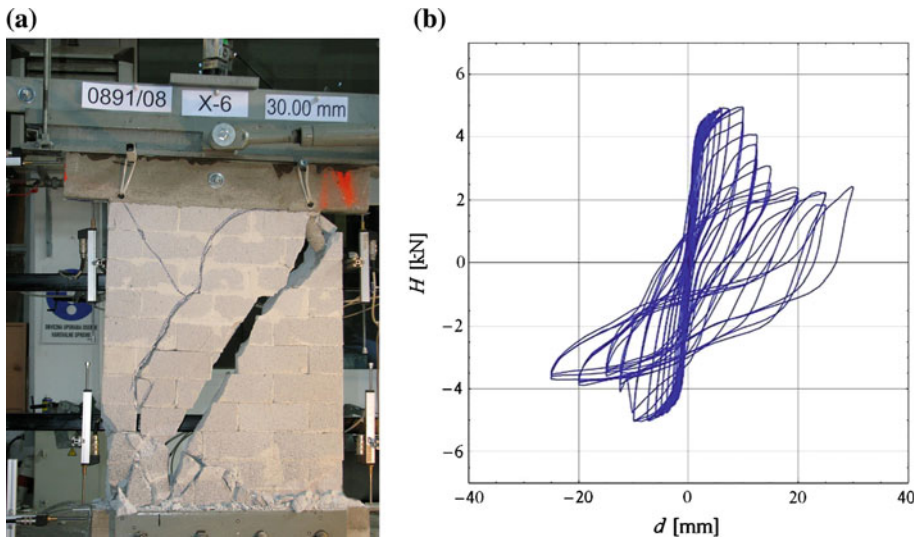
Shear failure mode of a confined model masonry wall: a failure mechanism and lateral load—lateral displacement hysteretic loops (b)
